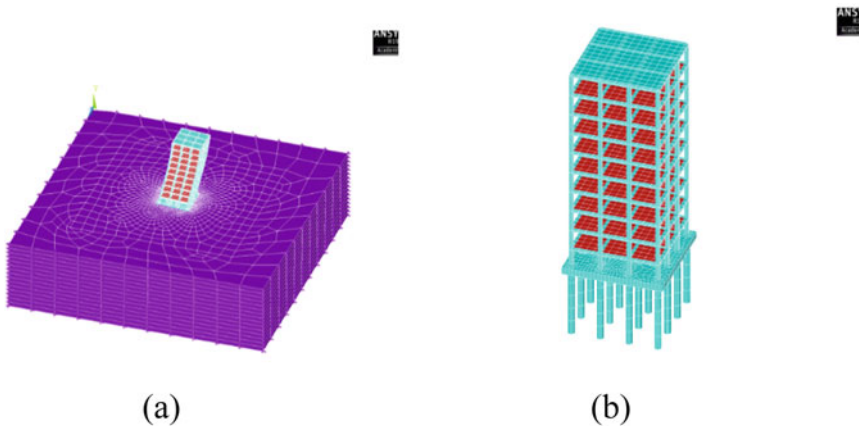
The 3-D finite element model of 10 storey building a Soil-pile-raft-structure system b building-pile-raft system
